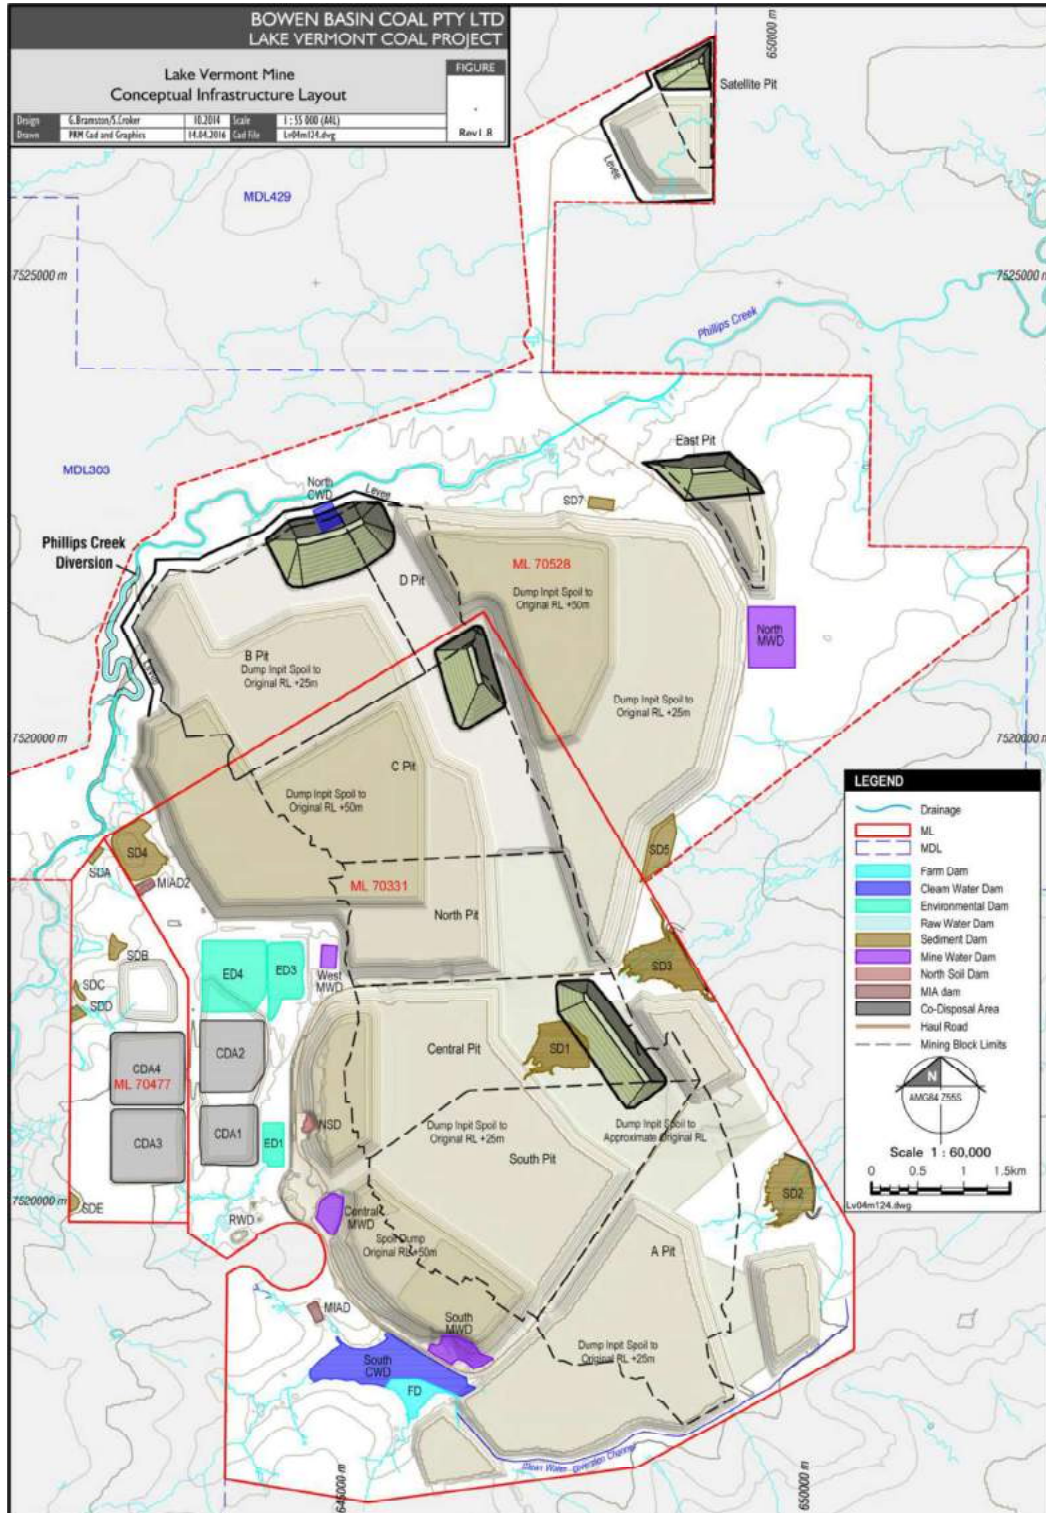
Site layout - Lake Vermont Northern Extension Project
